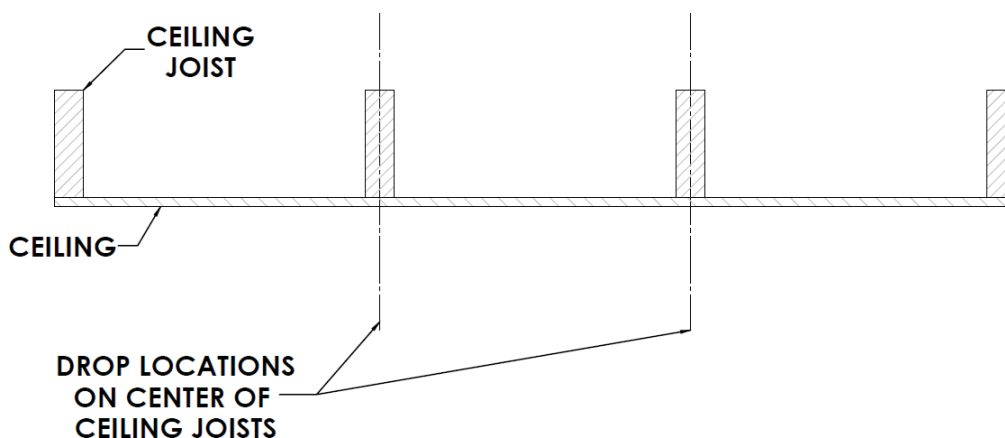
Ceiling Lift Track Bottom-Up installation
